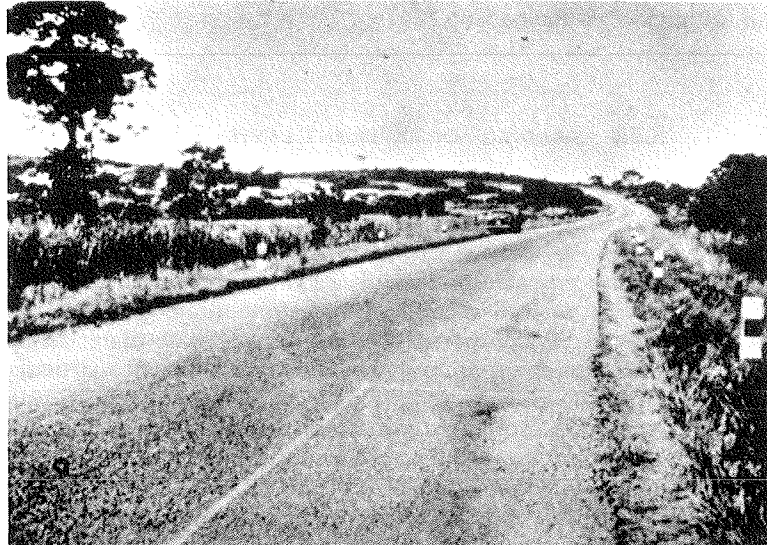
Typical edge failures due to using porous base materials in trench construction.
